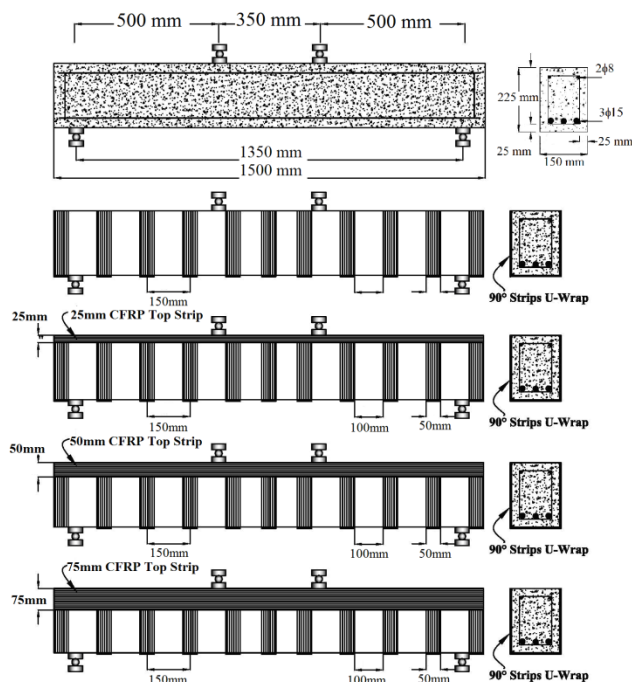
Typical layout of the control and strengthened reinforced concrete shear beam
